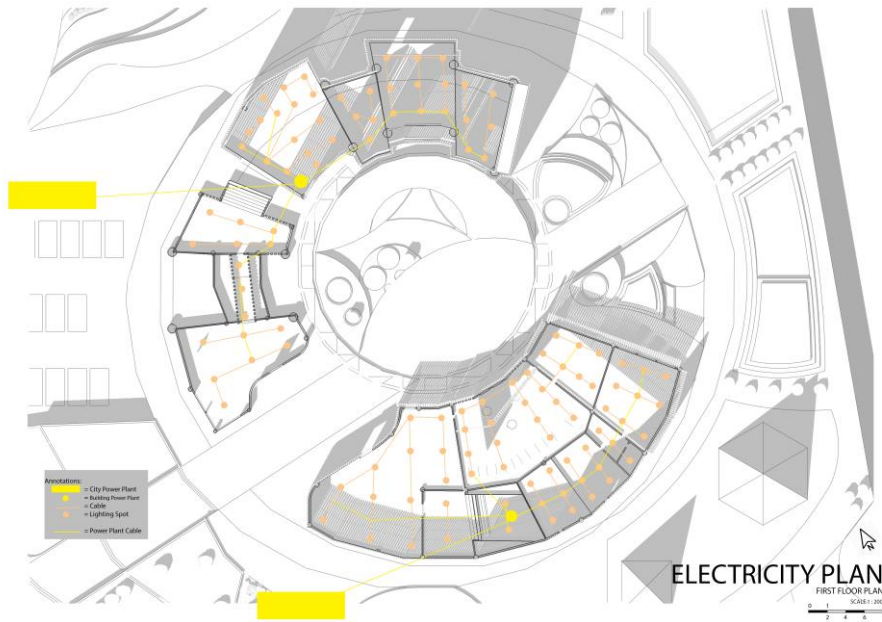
Electricity First Floor Plan (Source: author analysis)
